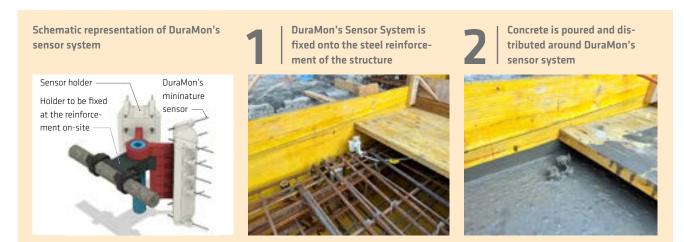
DuraMon multisensor installation for new concrete (also used in repair mortars and replacement concrete)
